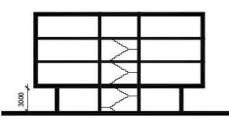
'Pavilion' building raised above ground level with parking or non-habitable shared facilities at ground level.
